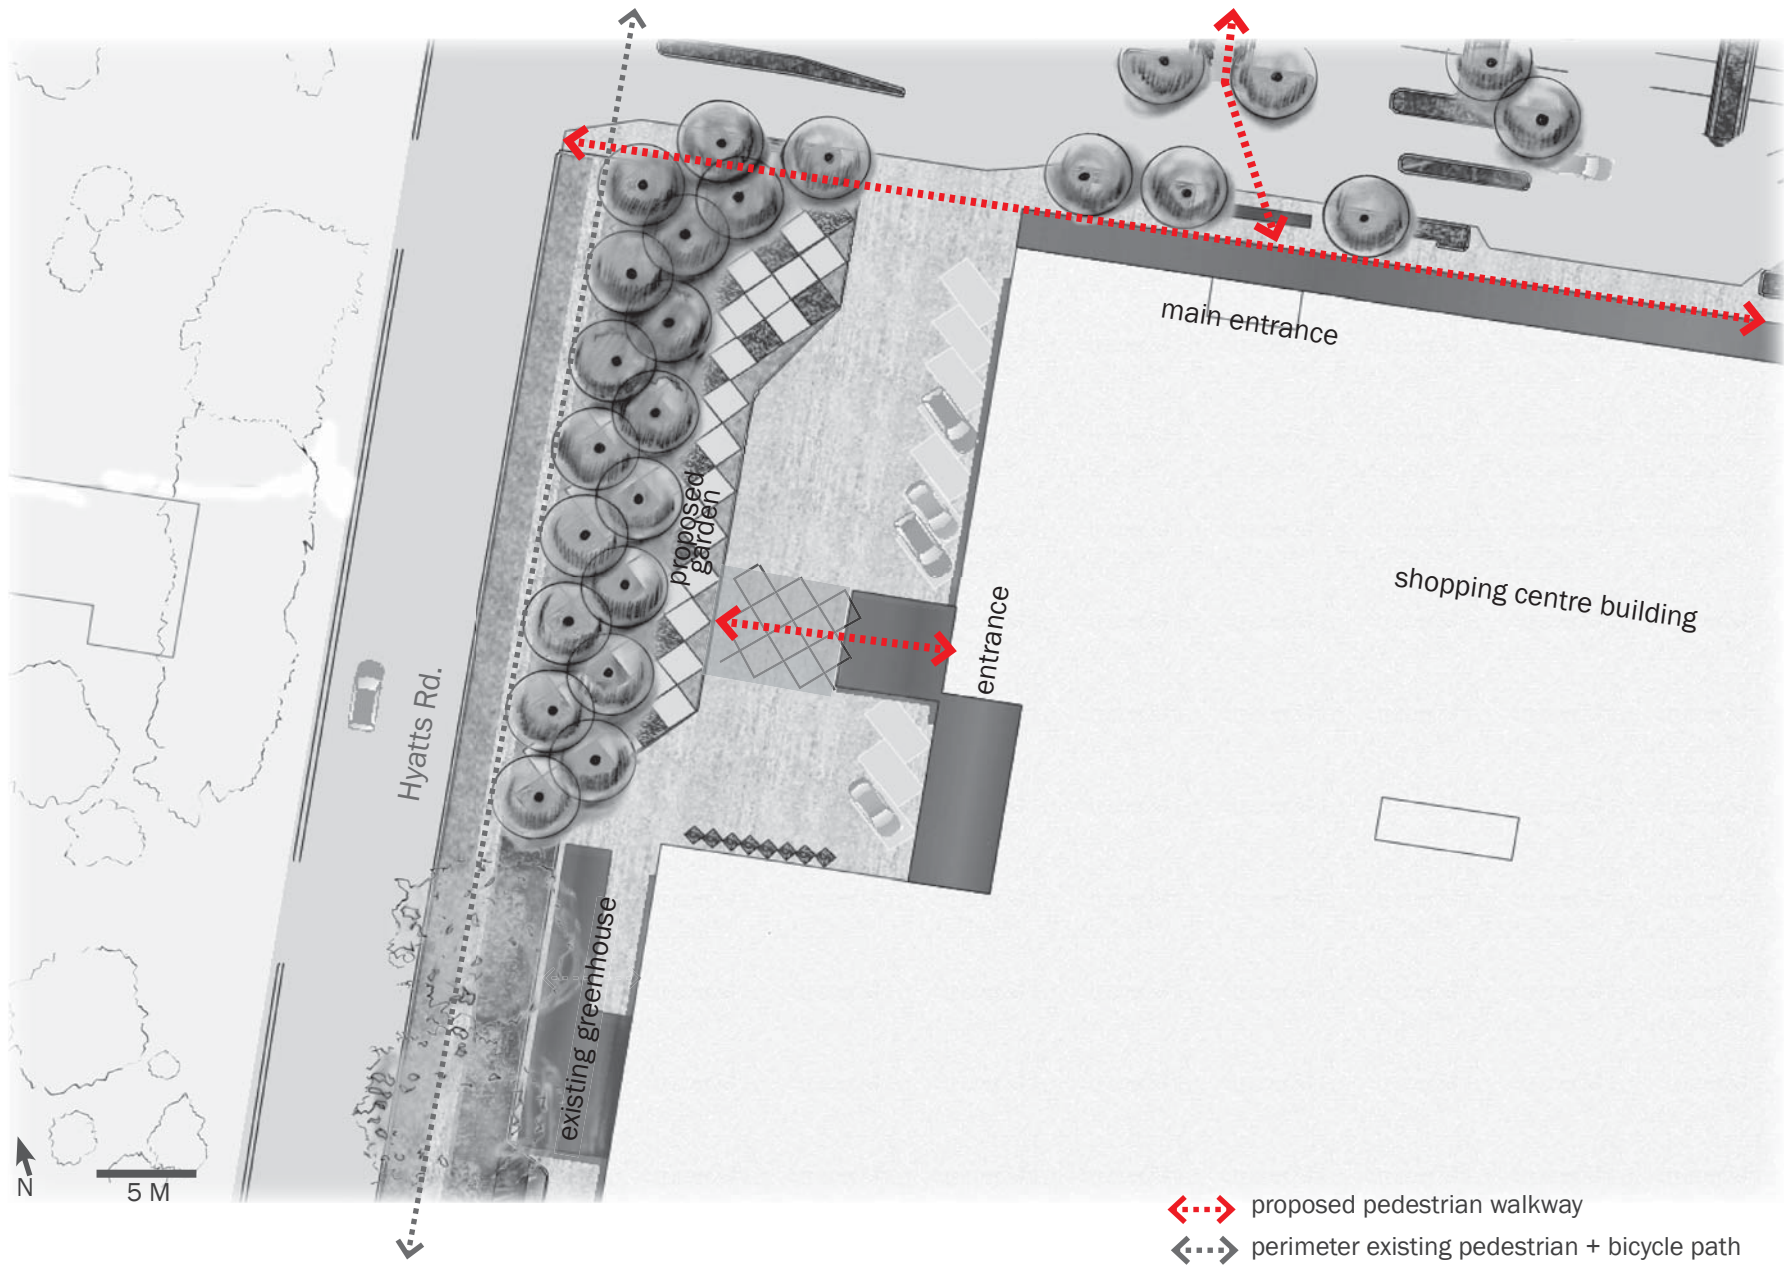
Site Plan - proposed garden adjacent to the existing green house.
